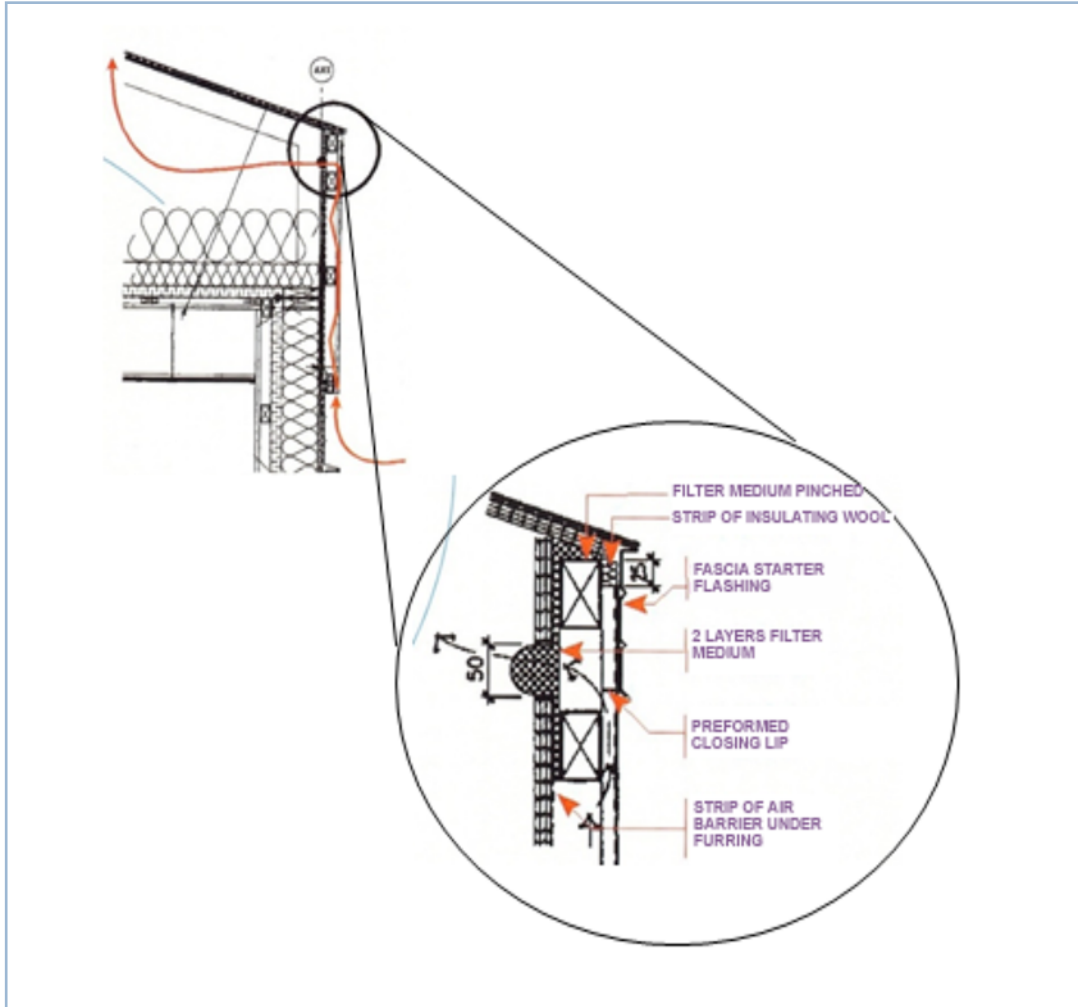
VENTING A VOID UNDER A ROOF / SOURCE: SHQ
